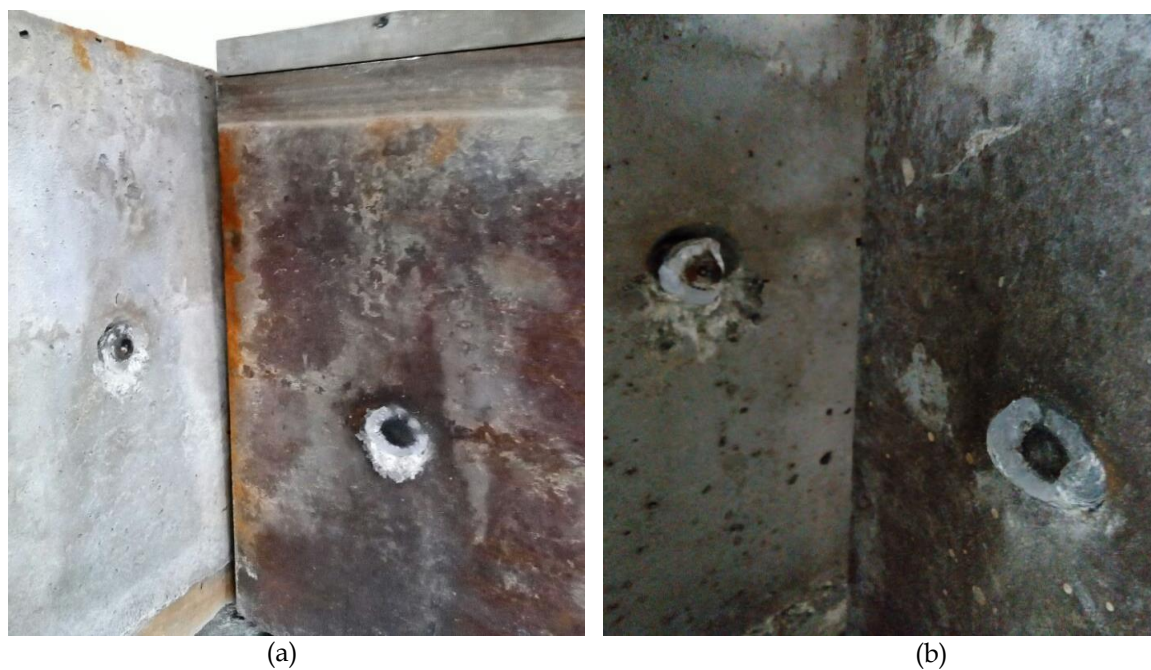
Failure of steel-concrete composite connection having  $C_3$  concrete; (a) concrete crushing at the bearing portion and (b) shank failure of headed stud at steel surface
